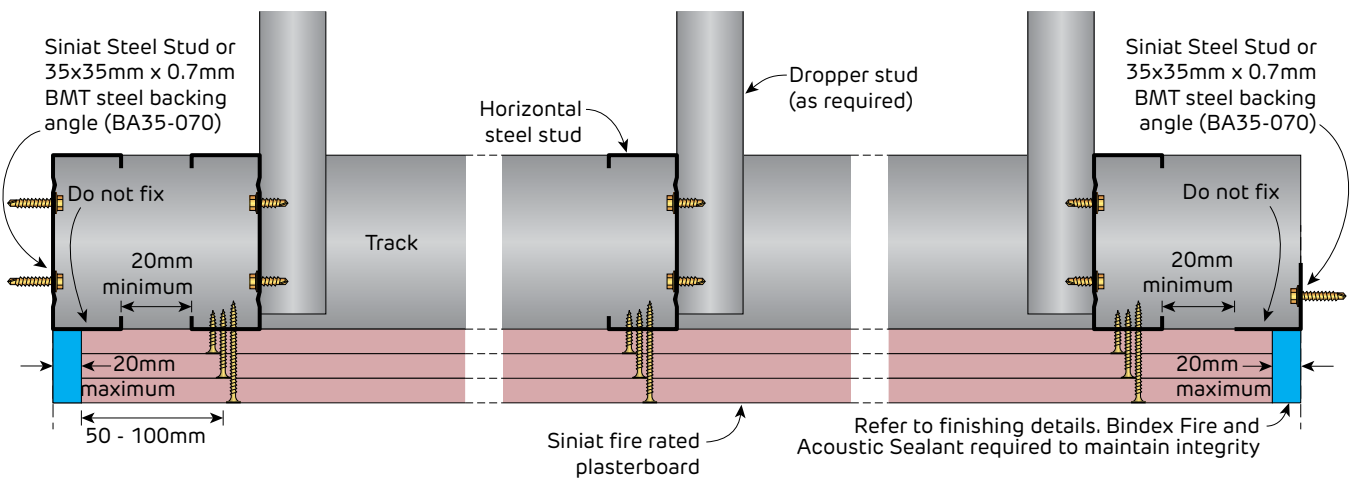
Stud Ceiling Type A2 - Edge Detail
